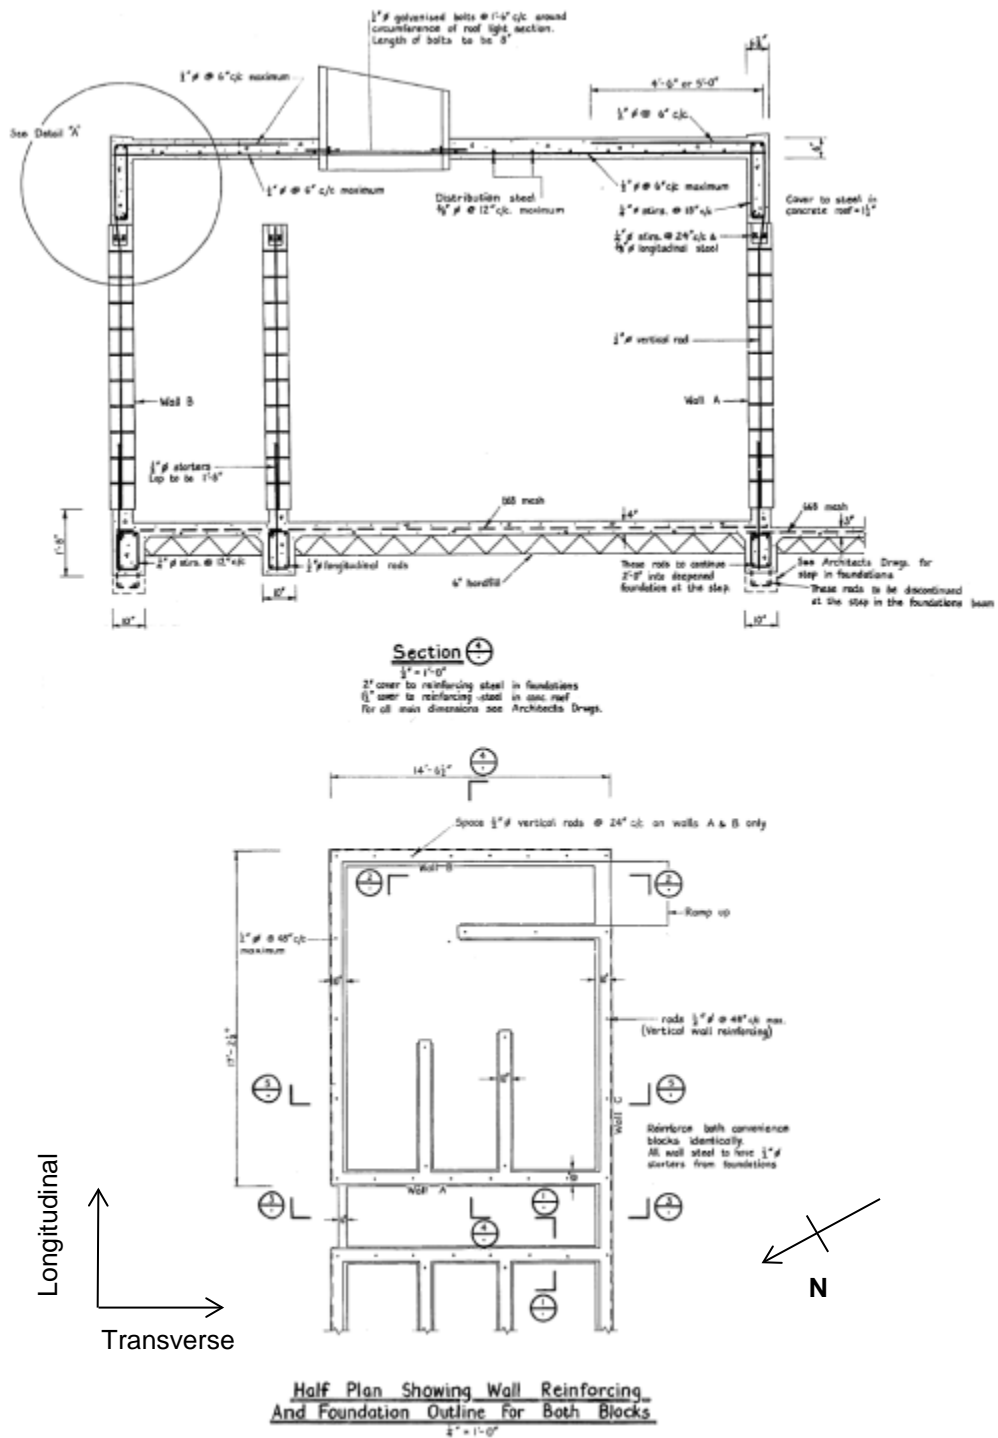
Excerpt from Drawings Showing Key Structural Elements
